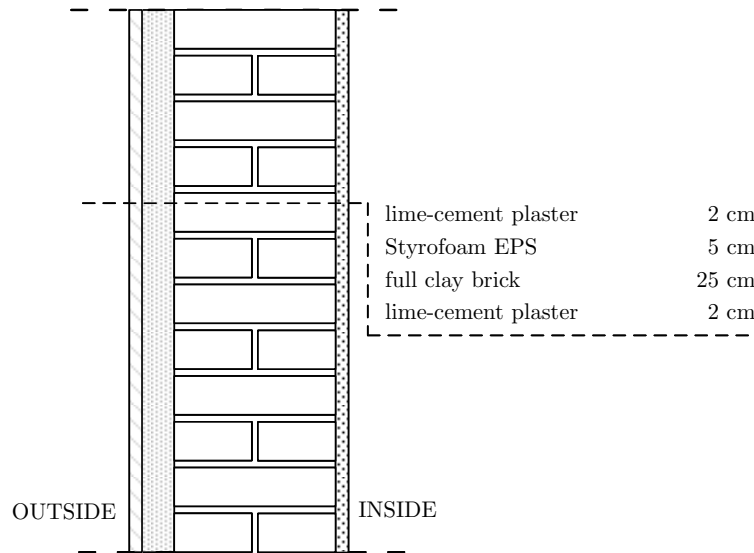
South- and north-facing external walls on the 13th floor (EW4).
